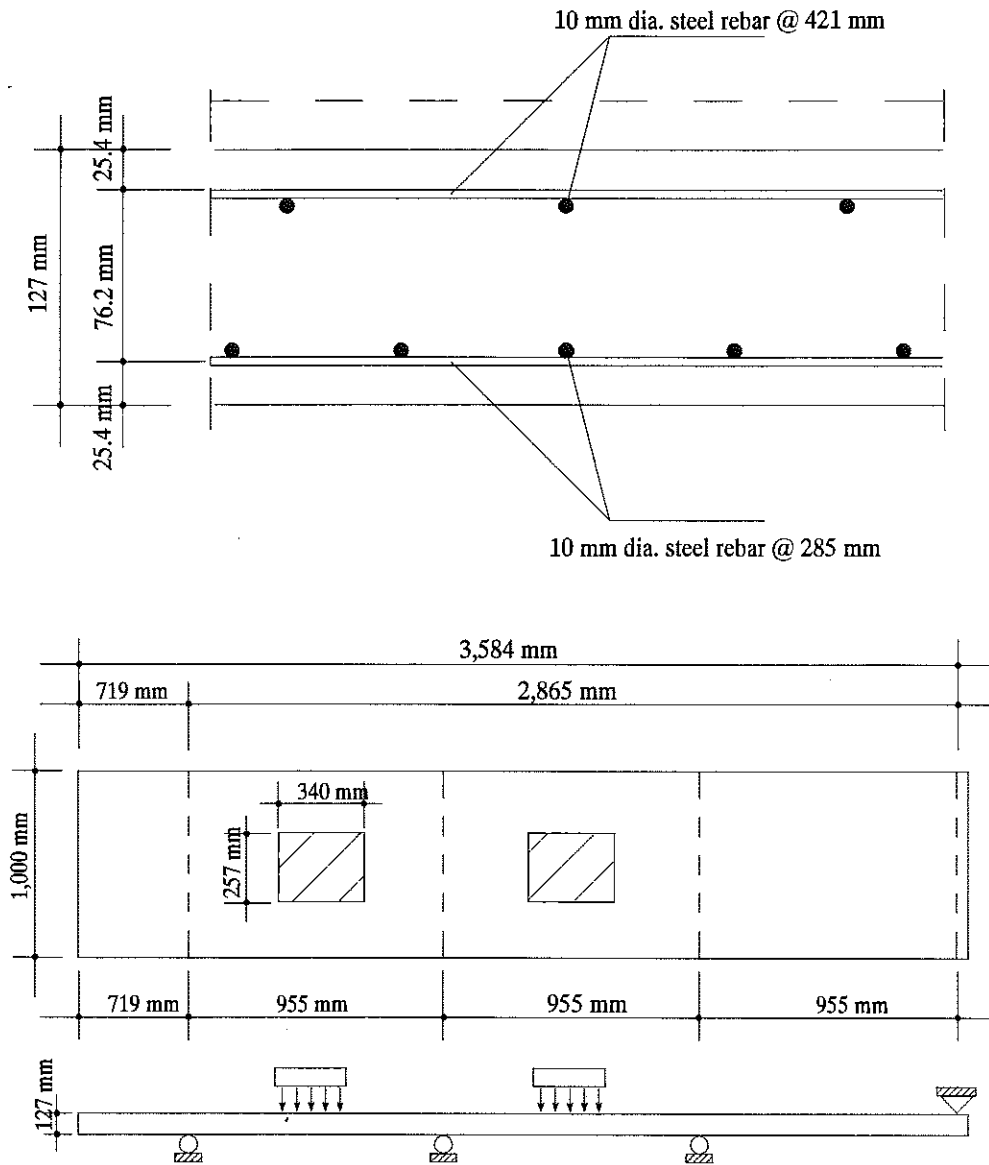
Test Set-Up for Scaled Model of Steel Reinforced Concrete Slab.
